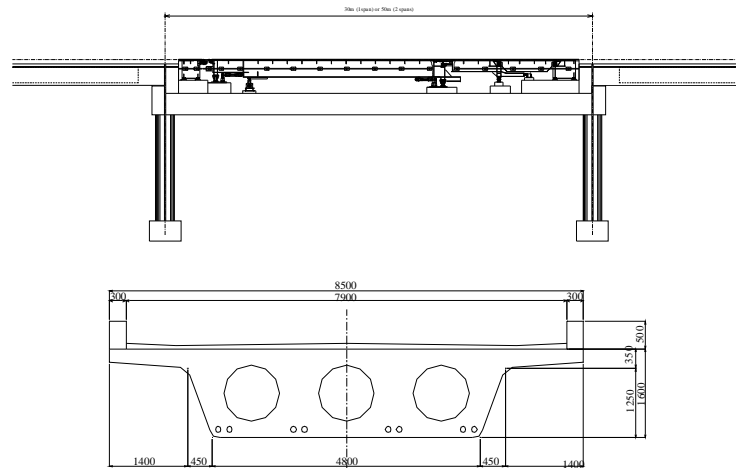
Cross Section of Monorail Viaduct Separated Type Pier
